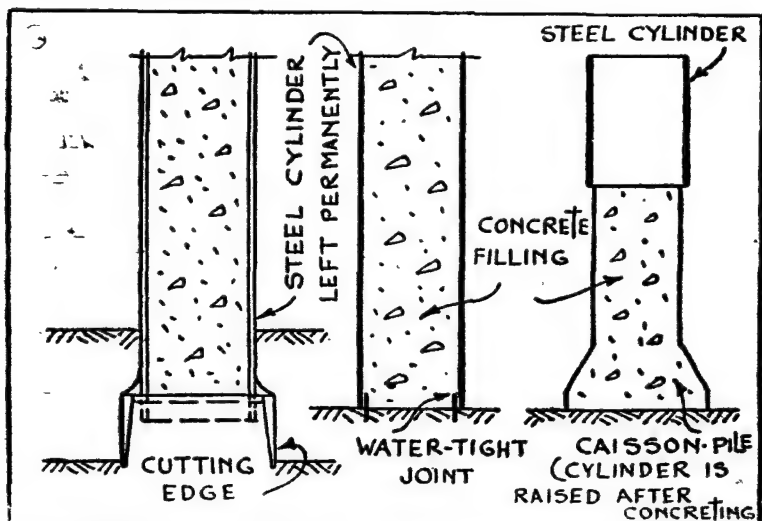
, 51, and 52, Steel cylinders and caisson piers.
